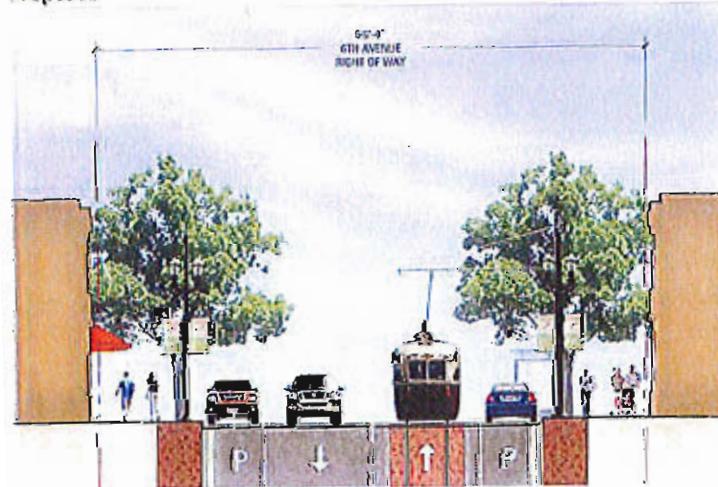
Envisioned 6th Avenue Streetscape, with Northbound shared travel lane
